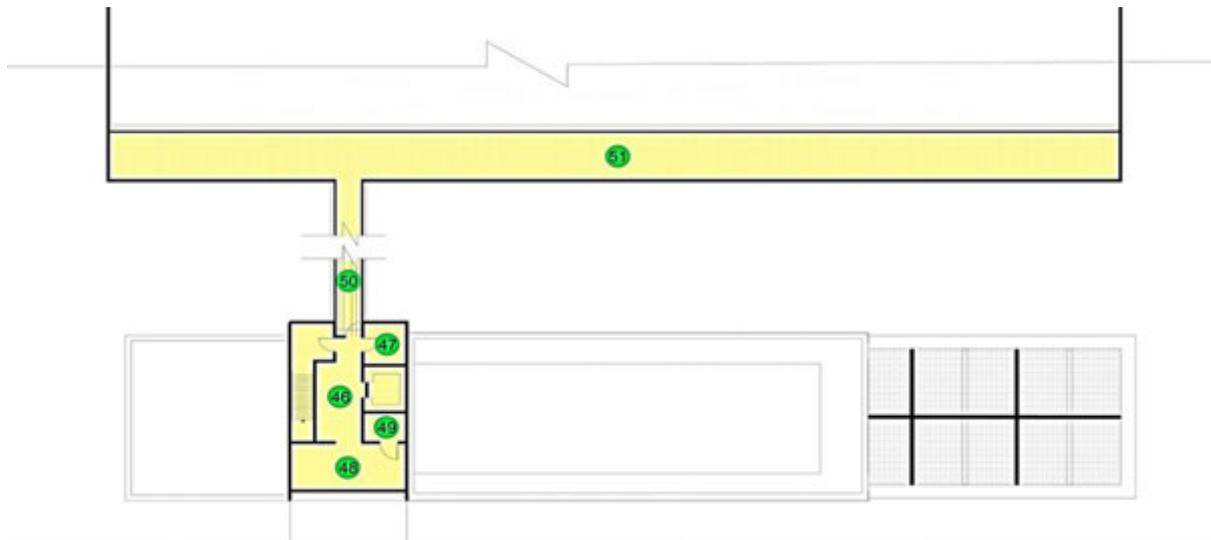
Second-floor plan of Sunset Park Recovery Facility
